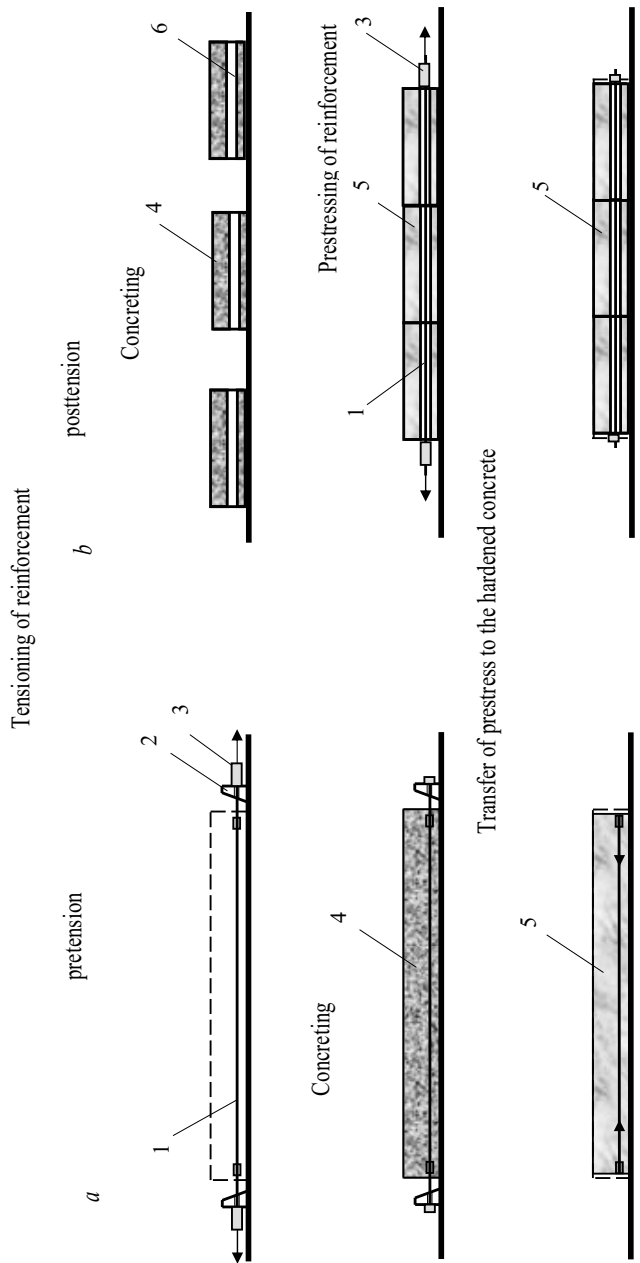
Diagram of prestress formation in reinforced concrete elements:
